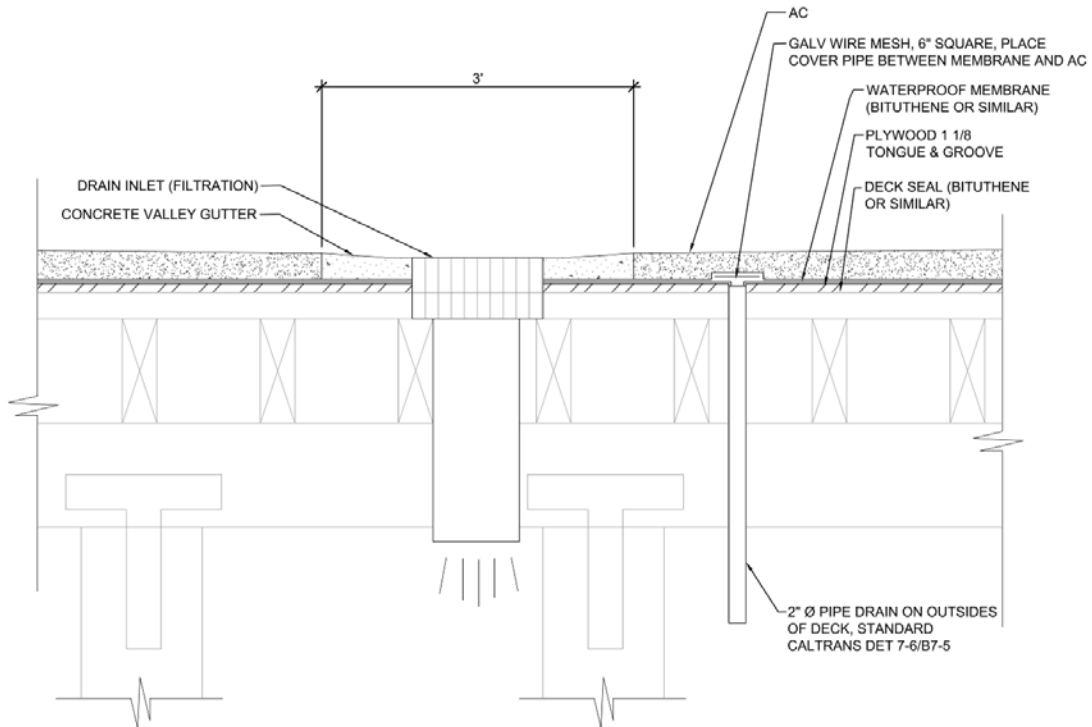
Deck Bleeder Drain Detail (Mesiti-Miller Engineers)
